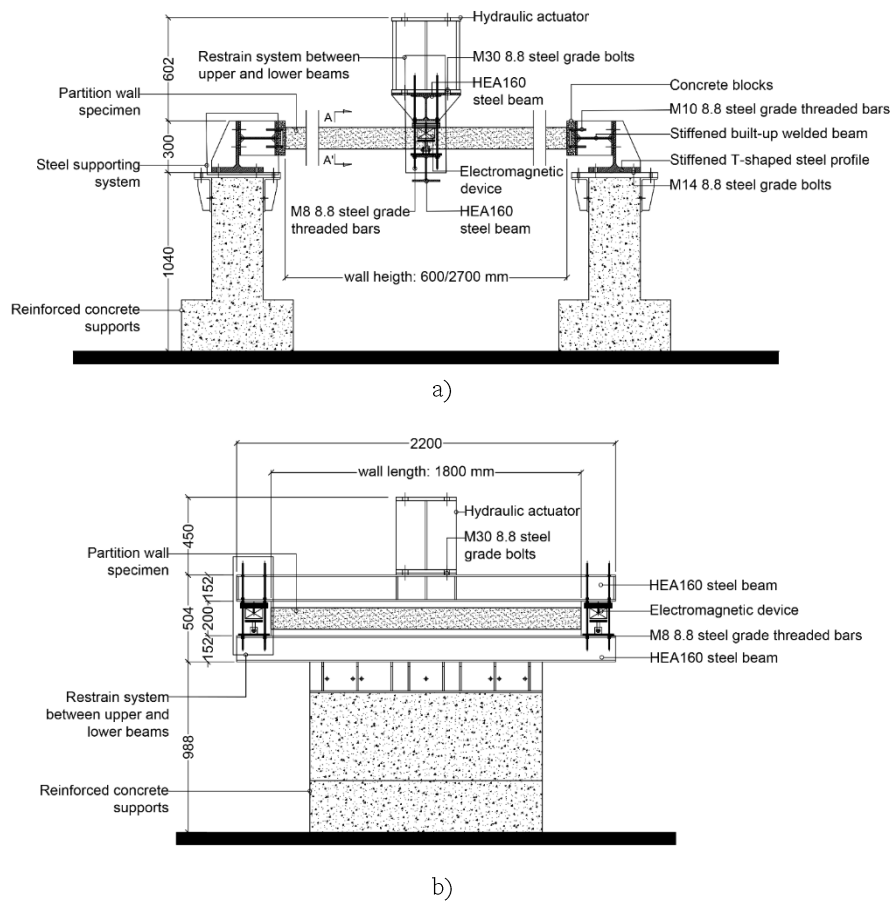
Technical details of test set-up for out-of-plane tests: a) lateral view; b) front view
